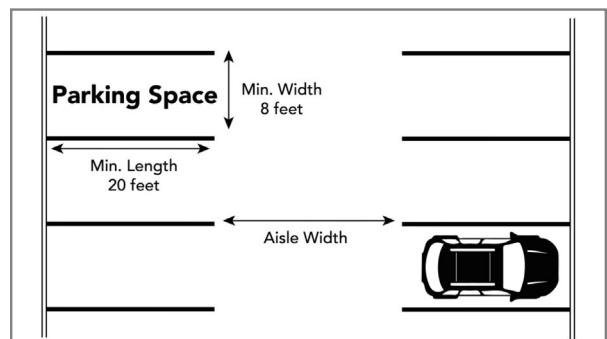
Parking Stall and Aisle Way Dimensions, 90o
